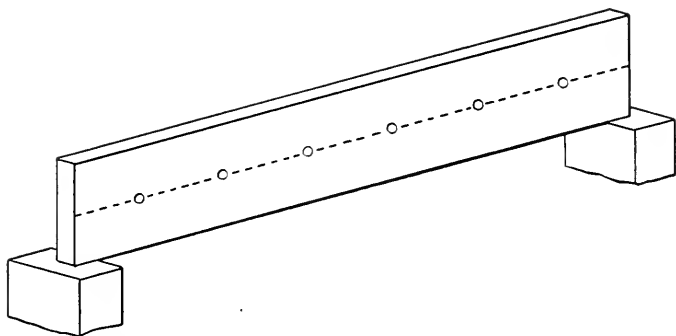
SHOWING THE BEST PLACE FOR HORIZONTAL BOLT HOLES.
